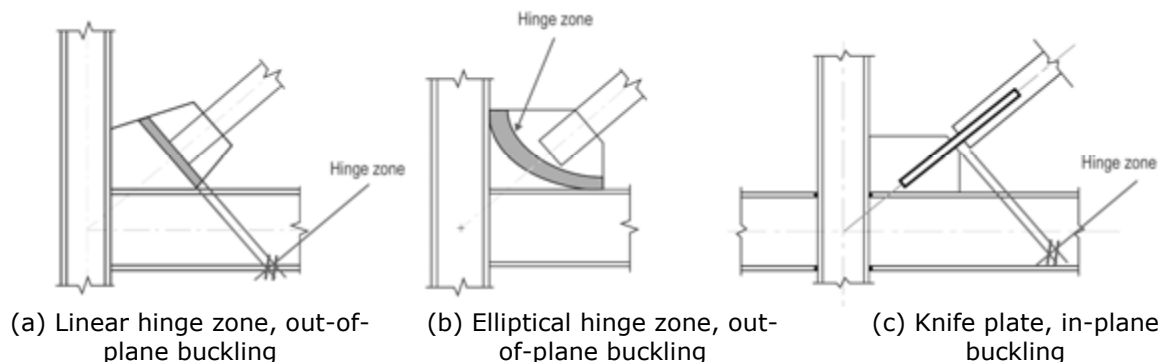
Gusset plate connections detailed to accommodate brace buckling by yielding in the connection gusset or knife plate [83]
